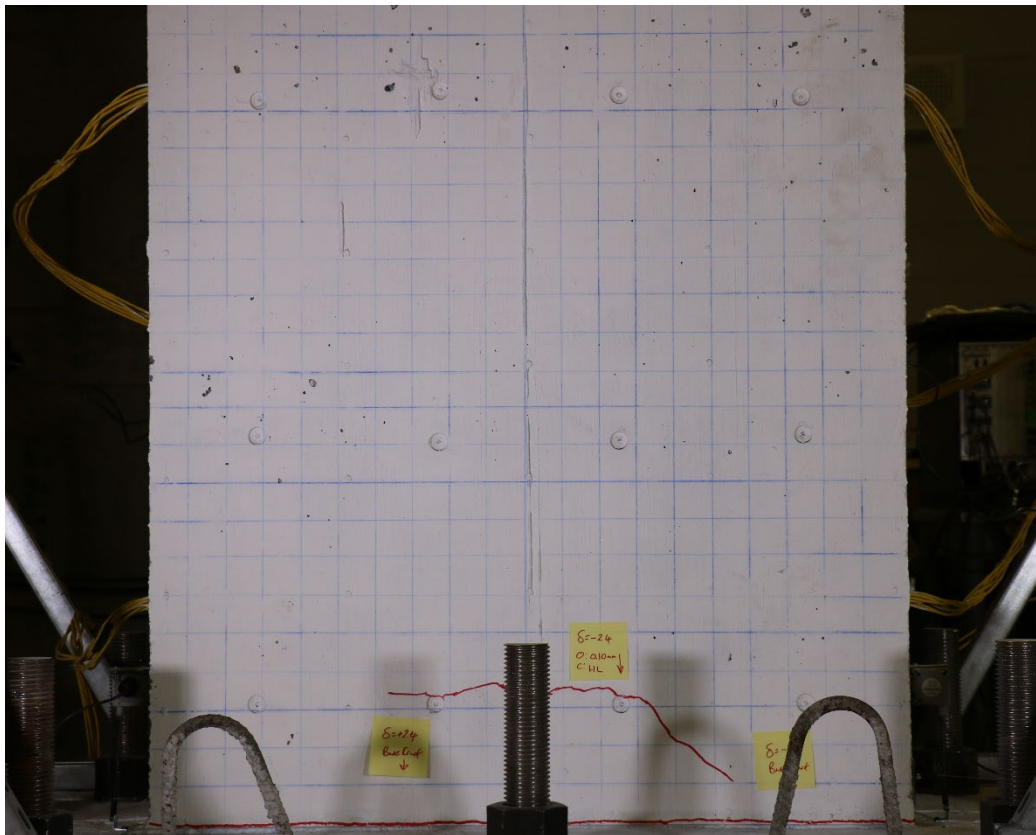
Crack pattern at 72mm displacement of wall SWS-R.
